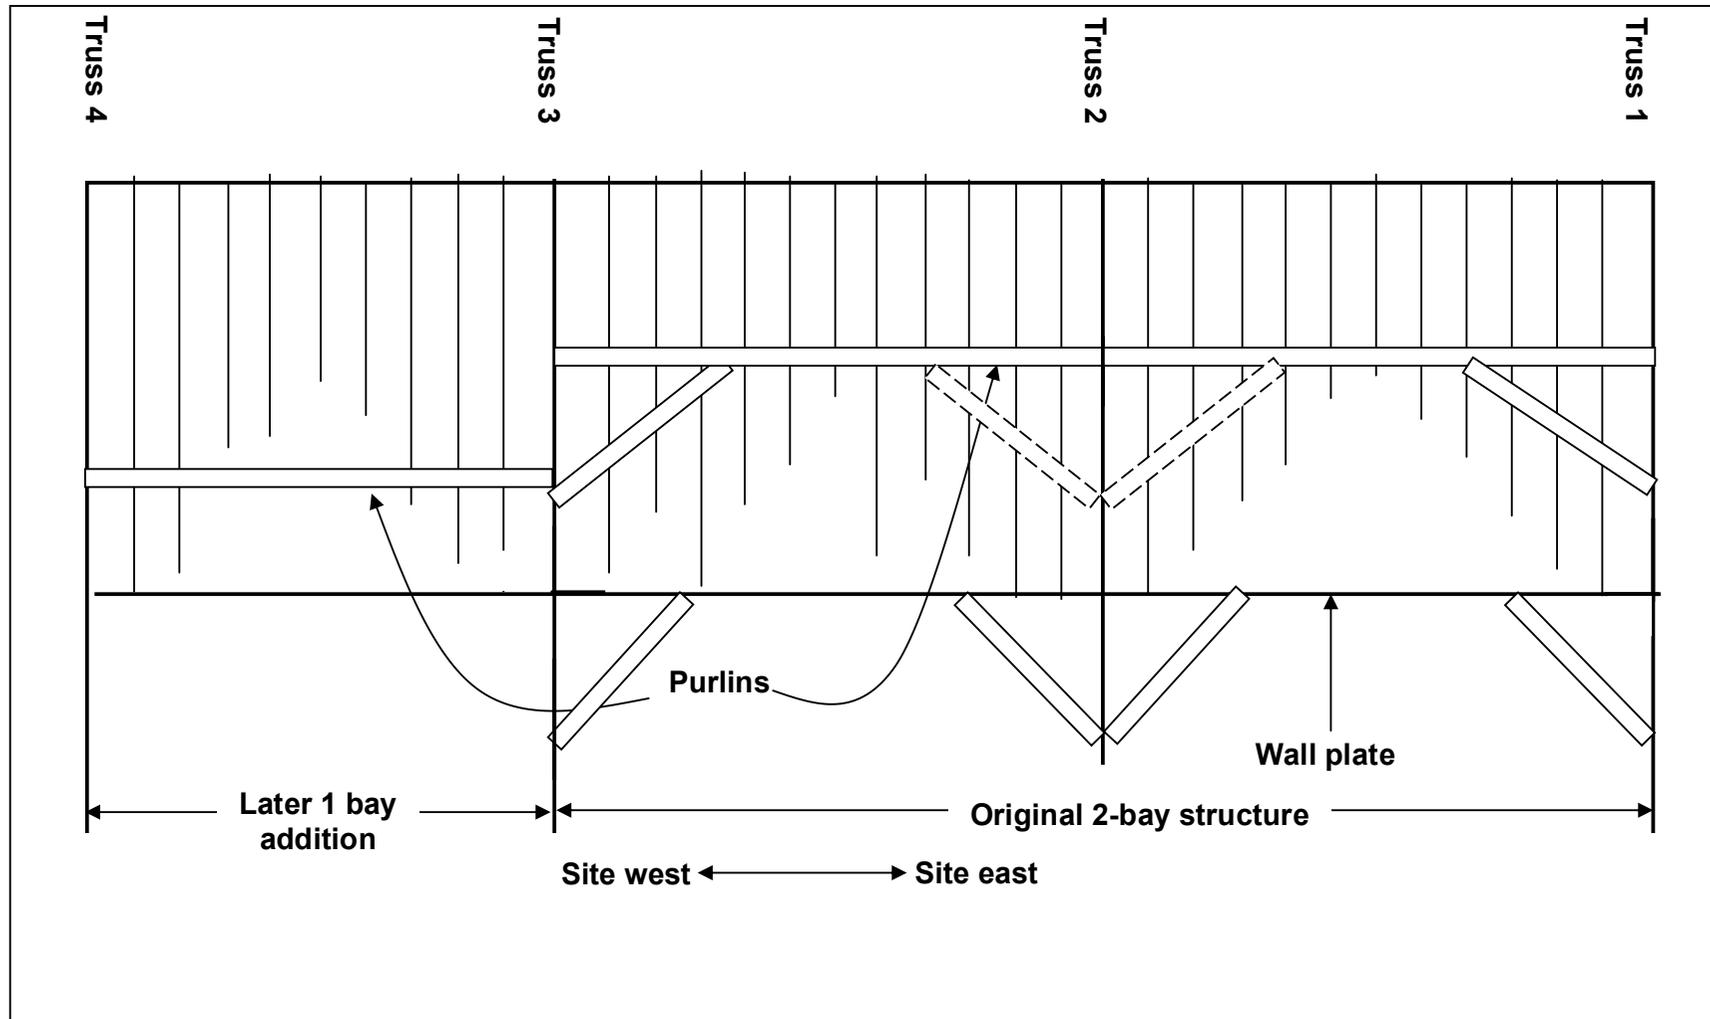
Simple schematic plan to show basic layout of site and conjectural phasing
